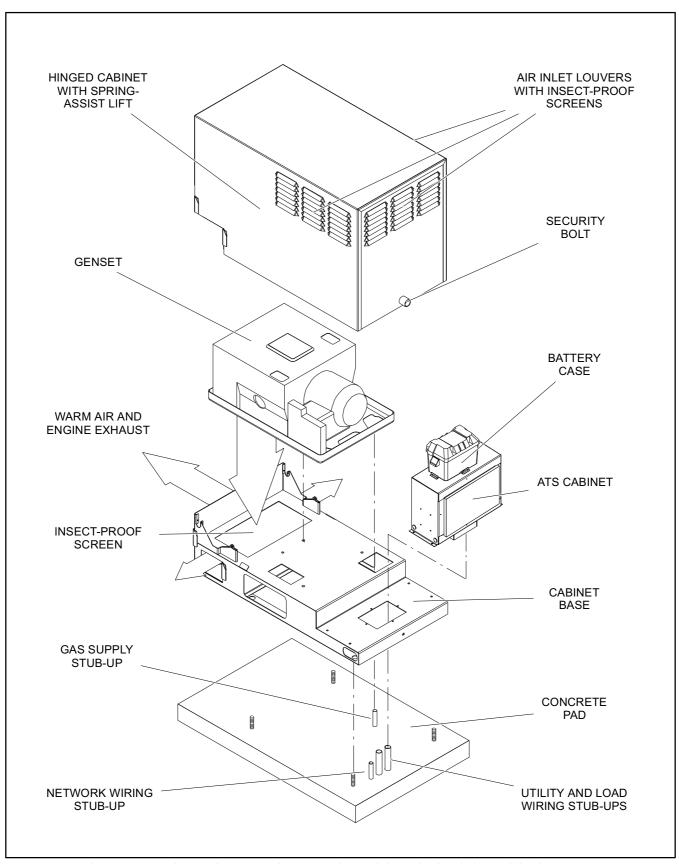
TYPICAL INSTALLATION IN AN OUTDOOR HOUSING ON A CONCRETE PAD
